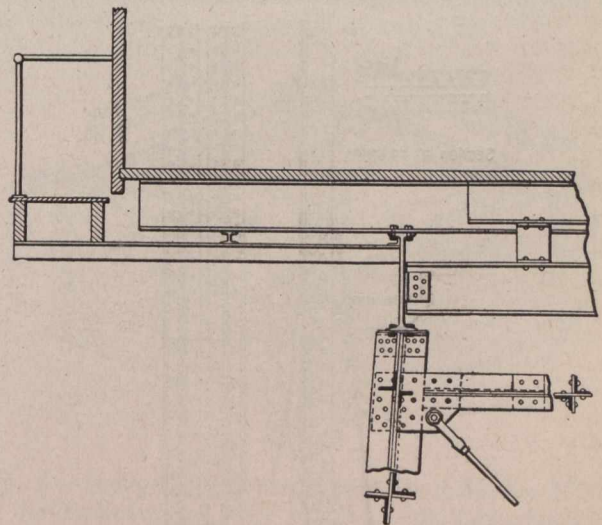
Detail View of Arrangement of Steel I-beam Grillage for Support of Tank.
